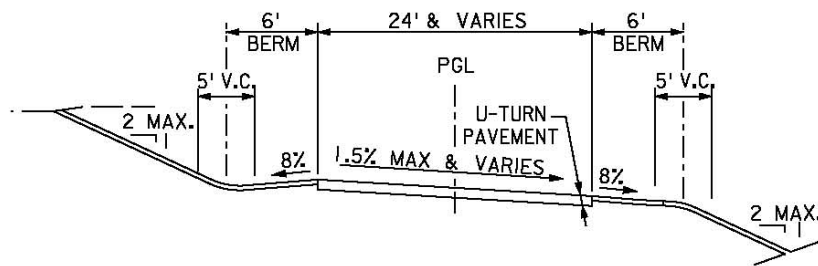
A - 42 U-TURN PAVEMENT SECTION
